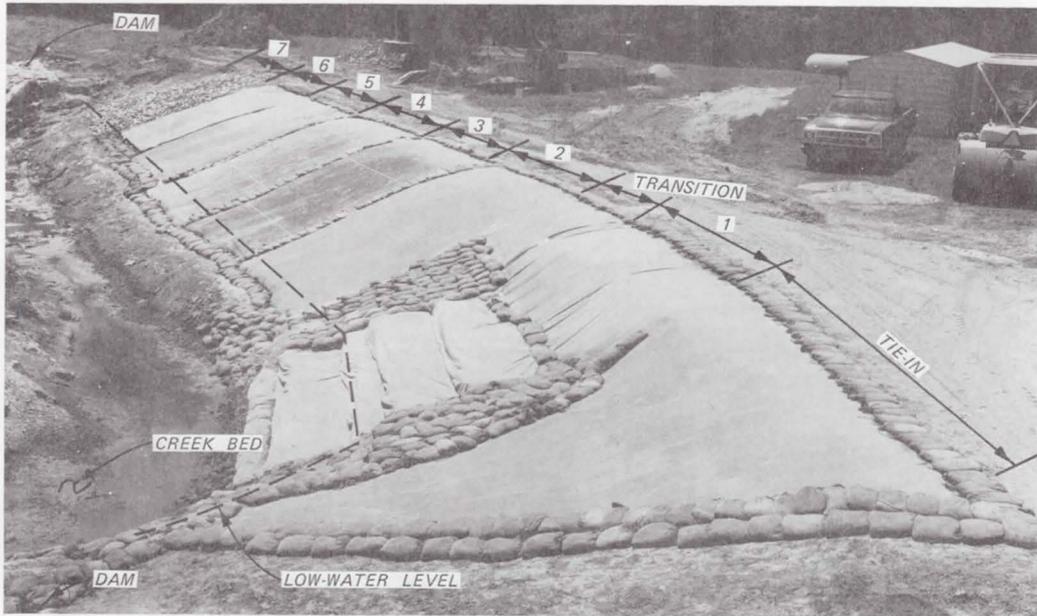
View (looking downstream) of test materials installed prior to removal of dams at each end of test area
